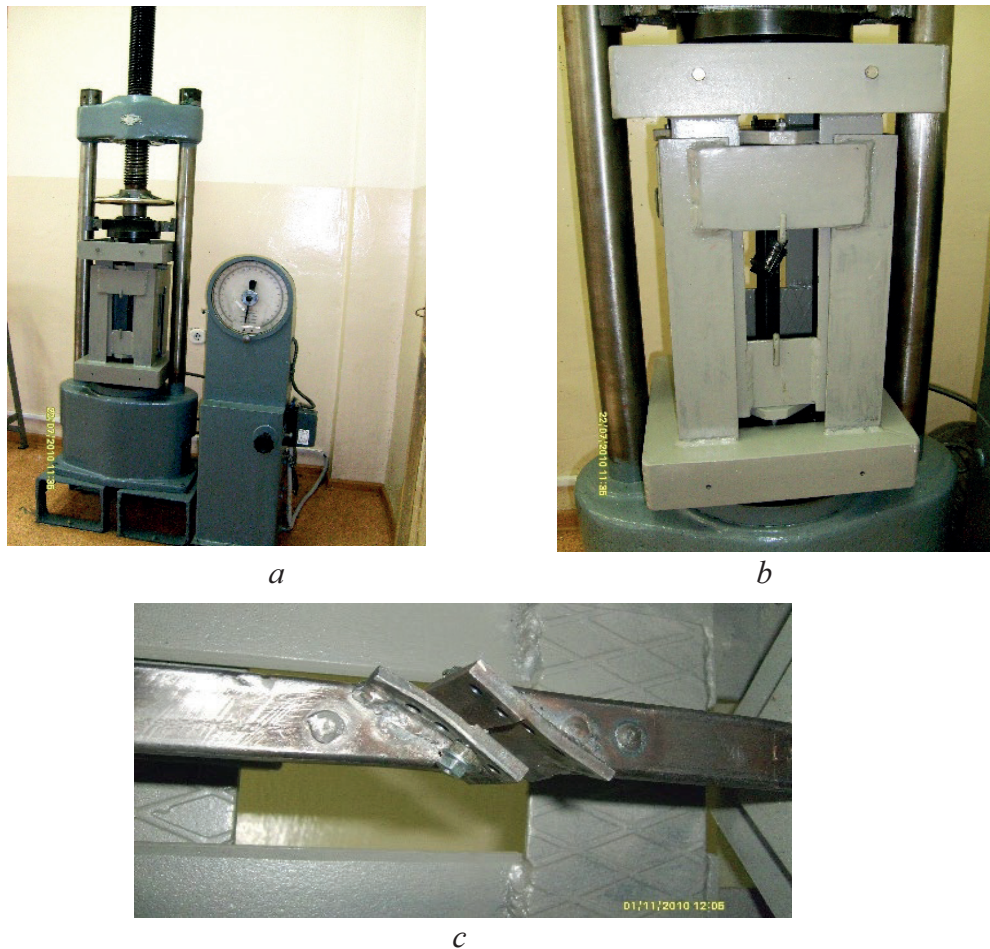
Pictures of a general view of the test facility (a), its reverse part (b) and a prototype after destruction due to bending of oblique flanges (c)
